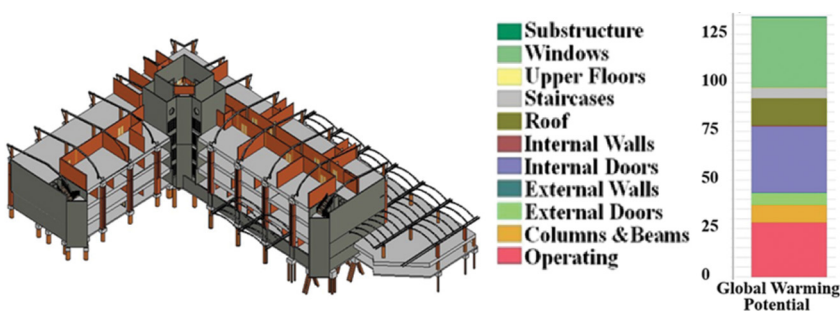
Technical and Further Education college GWP cradle-to-grave [20].
